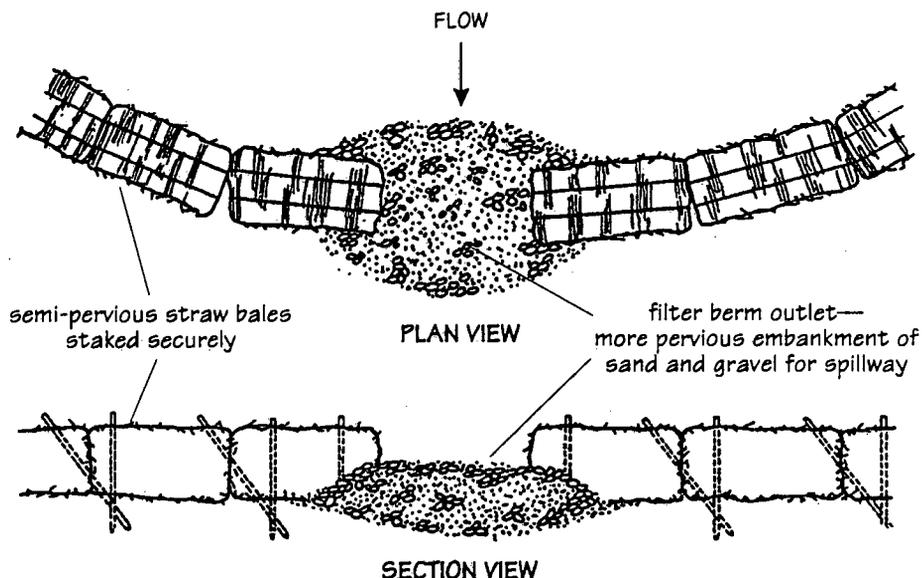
Details of straw-bale sediment barrier construction. (Adapted from Idaho Department of Lands, 1992.)
